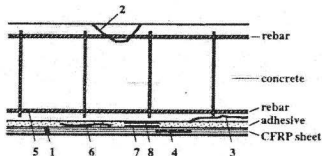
Longitudinal section of a repaired beam (Meier et al., 1993)
